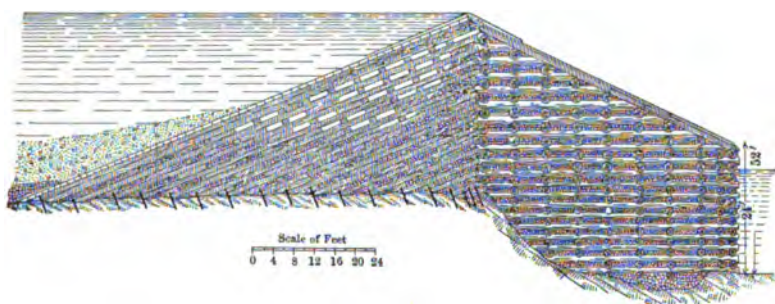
Cross-section of Old Holyoke Weir, Mass.
